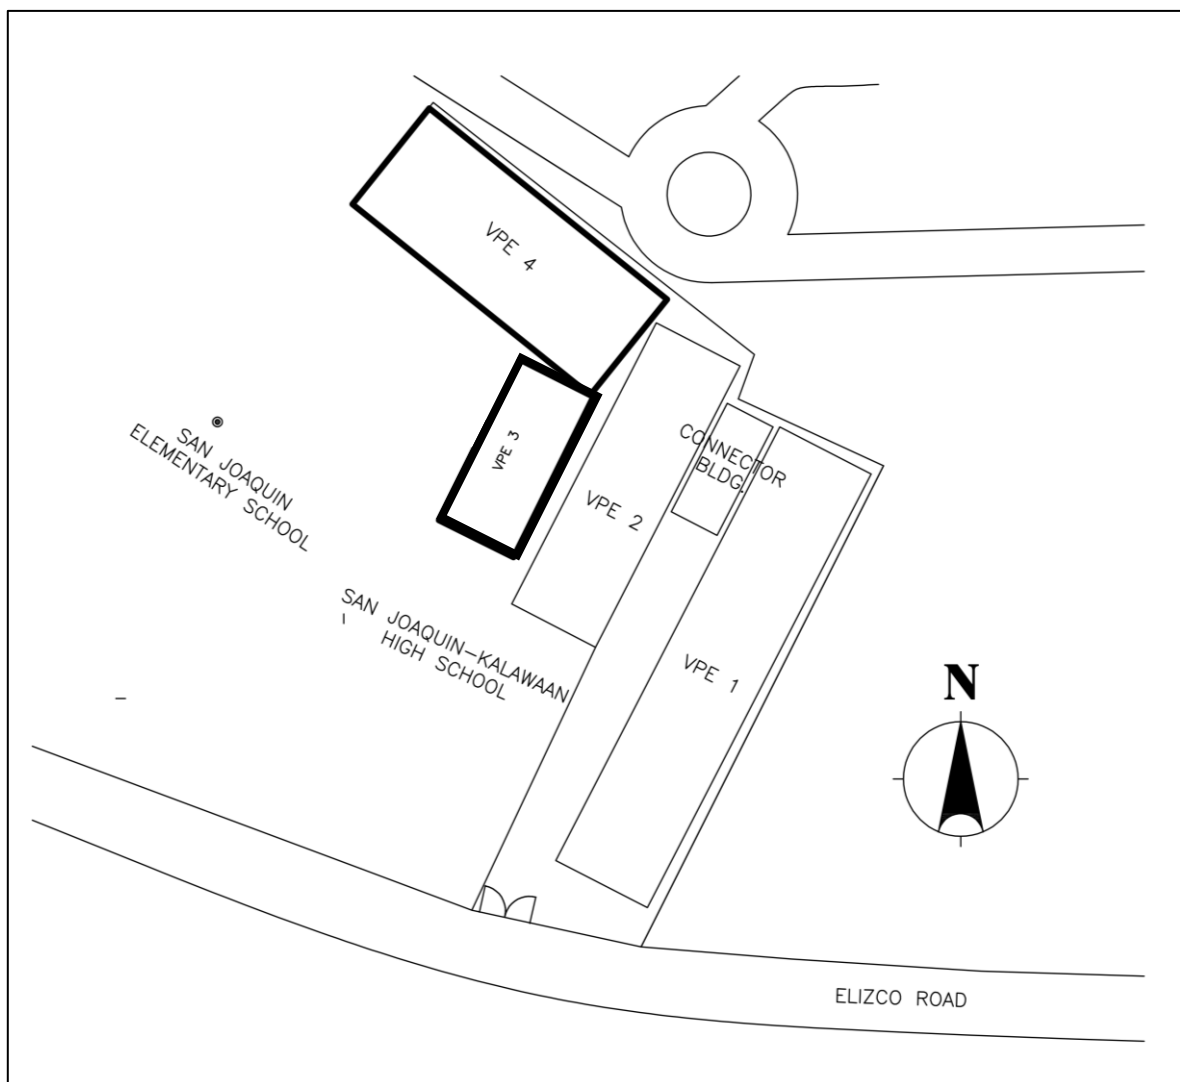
Site Development Plan of San Joaquin-Kalawaan High School
